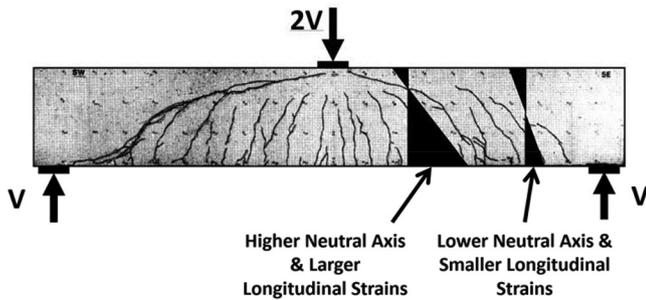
Longitudinal straining at two sections of reinforced concrete beam.
